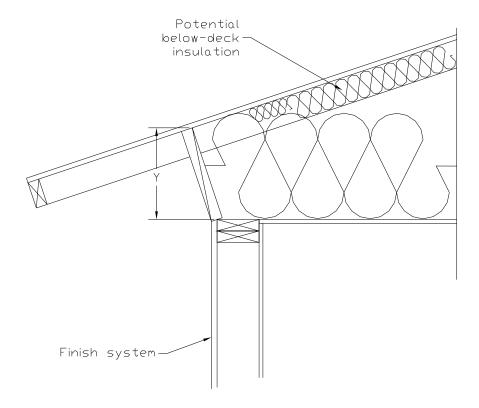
Section at Attic Edge with a Raised Heel Truss
